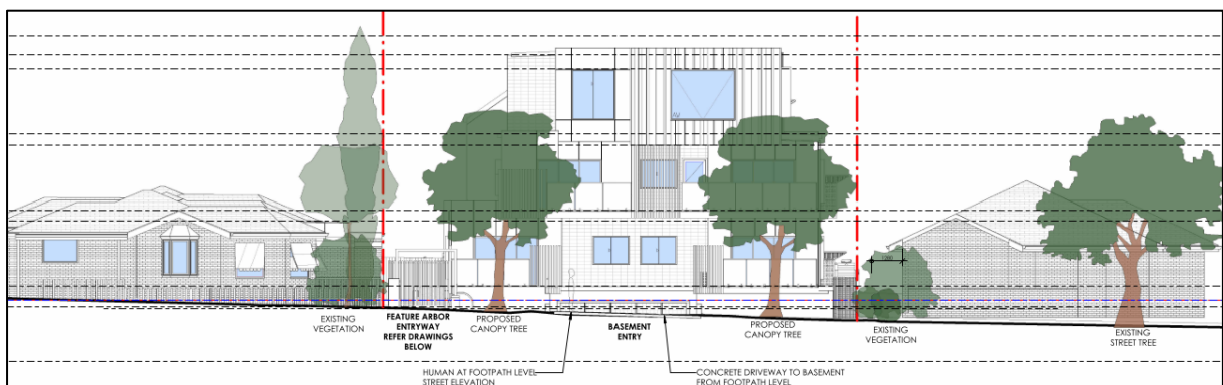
(Above): Southeast streetscape elevation showing frontage to Barrabool Road. Source: Application documents
